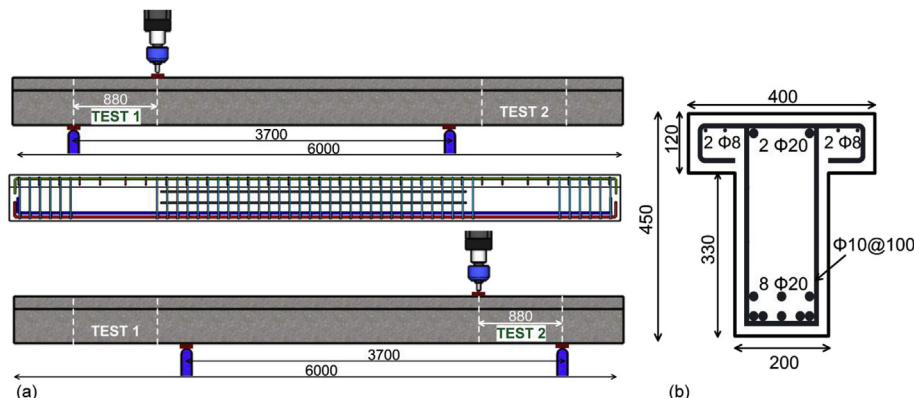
(a) Schematic test set-up; (b) cross-section (dimensions in mm).
